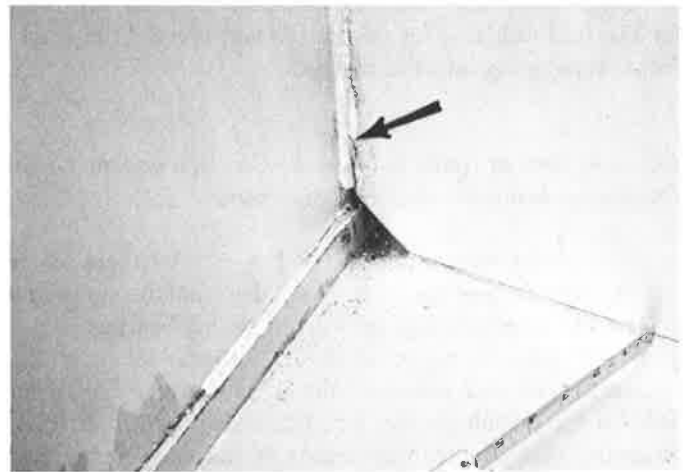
Crack in Vertical Weld Between Cap Web and Diaphragm Inside Box Cap Member
